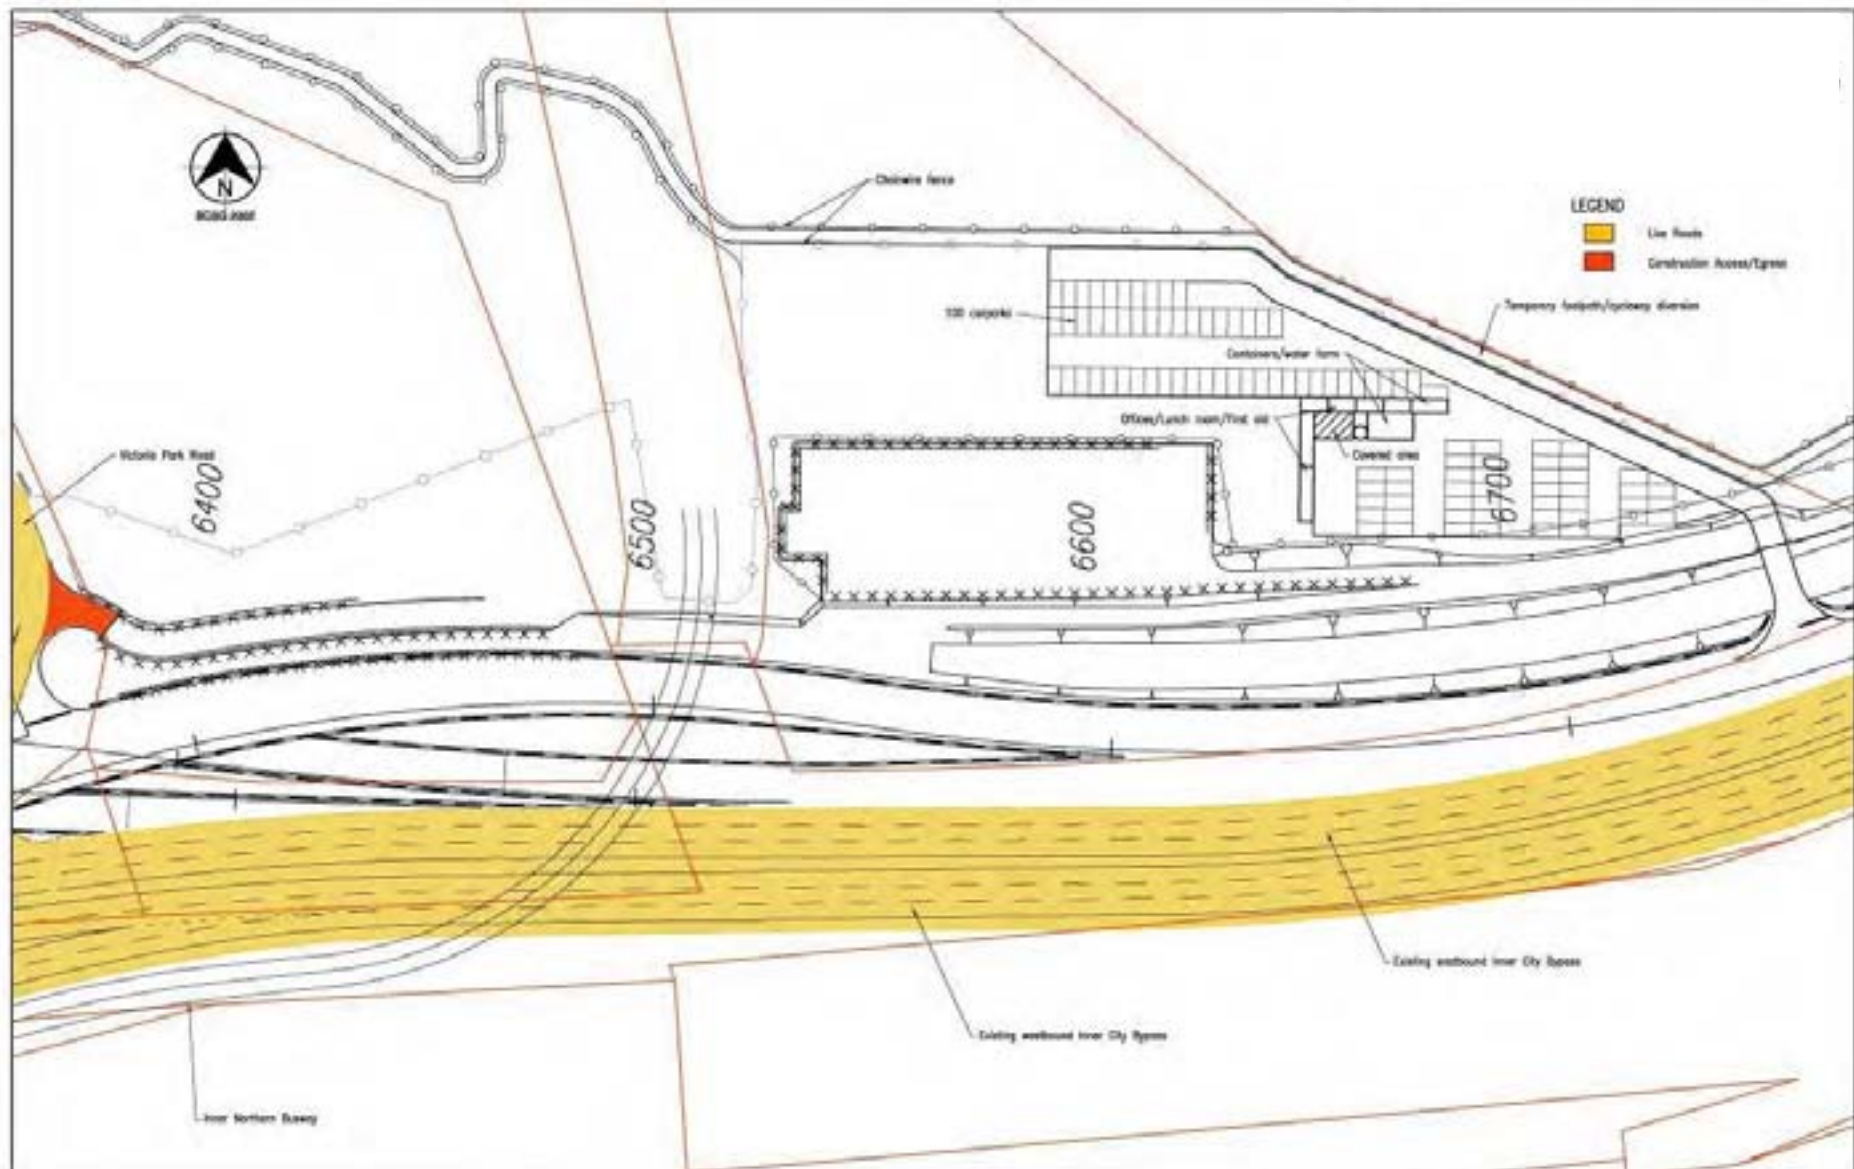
Eastern worksite – Stage 1, 2 & 3 layout
